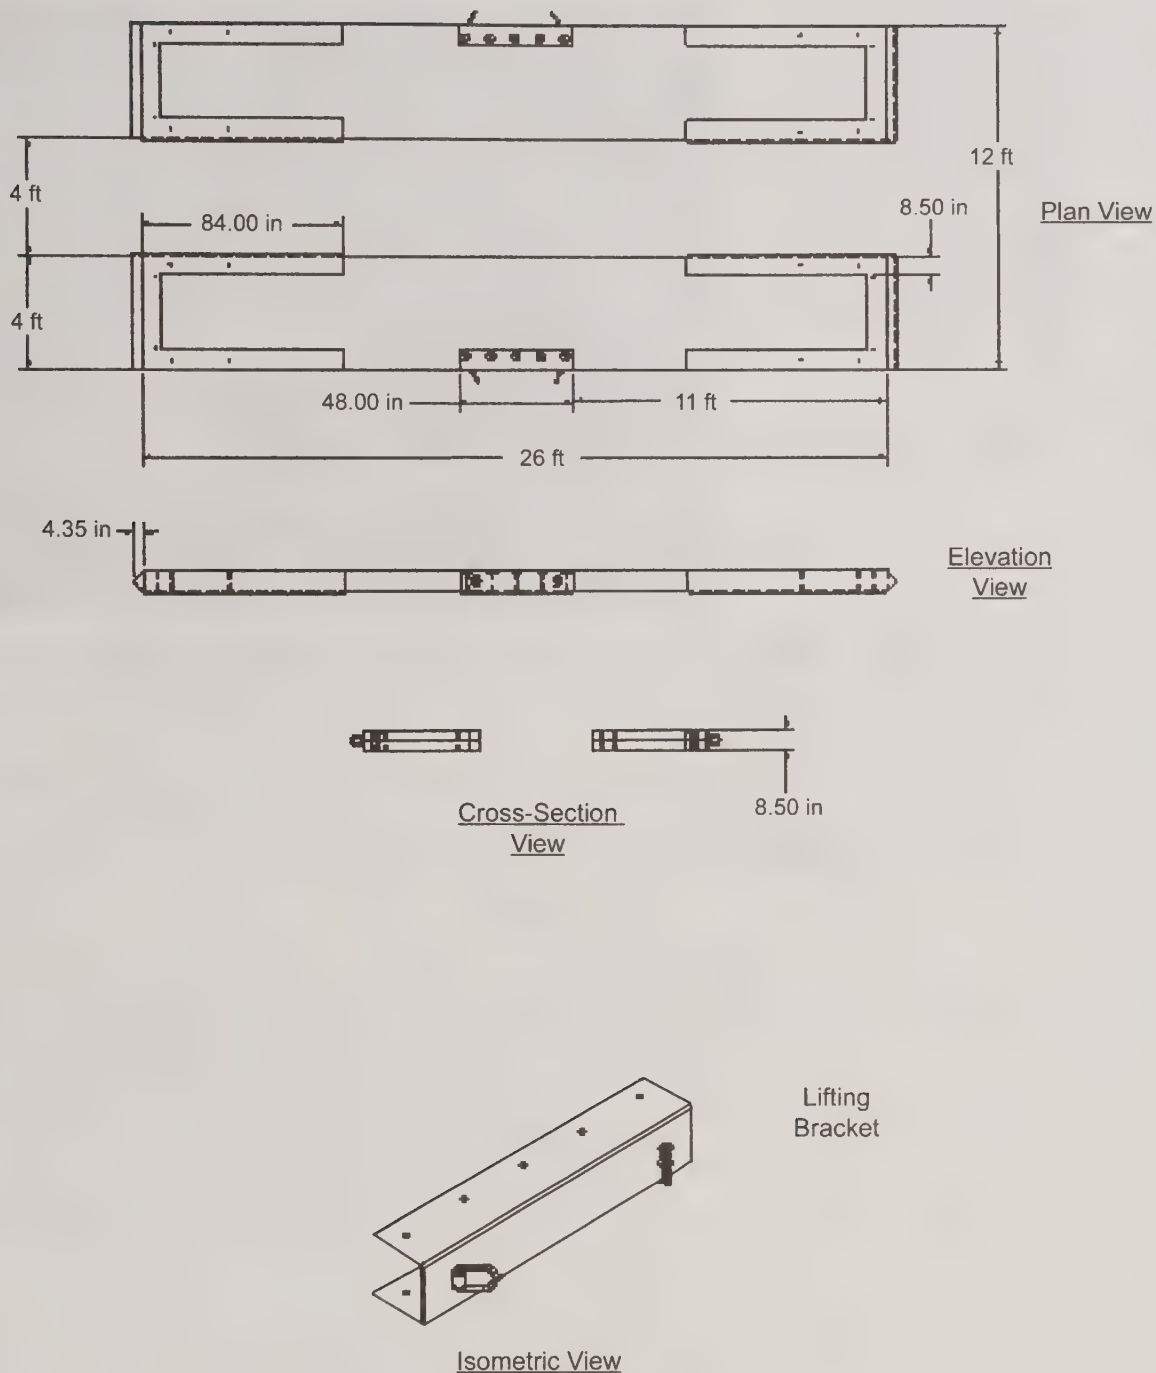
Plan, elevation, cross-section, and isometric view of Auburn's longitudinal glulam skidder bridge. (Drawings provided by Steven Taylor)
